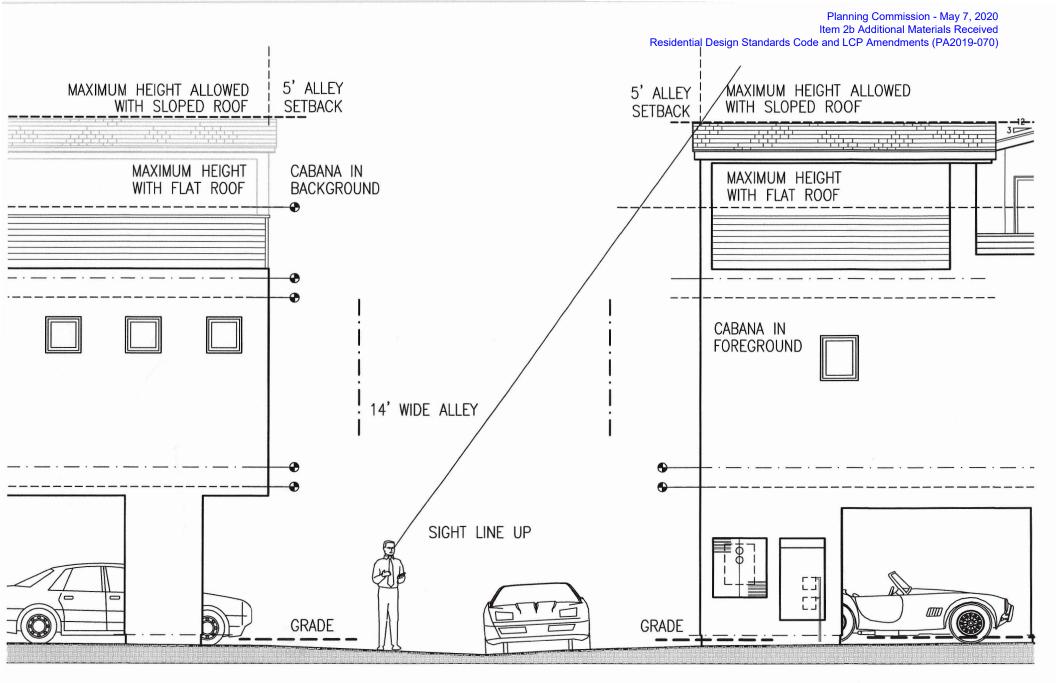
SMALL CABANA SIDE ELEVATION 3/16"
